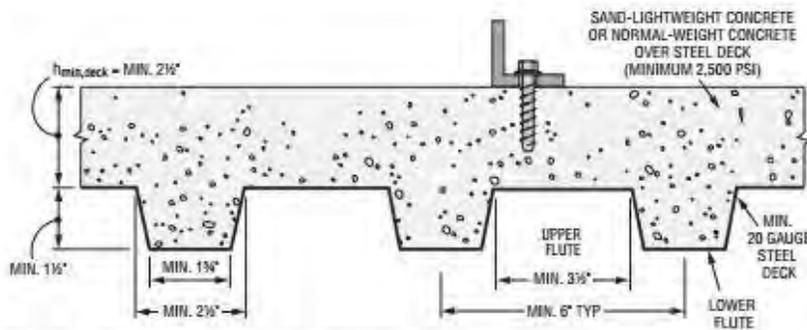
Figure B. Installation in the Topside of Concrete-Filled Deck Assemblies
